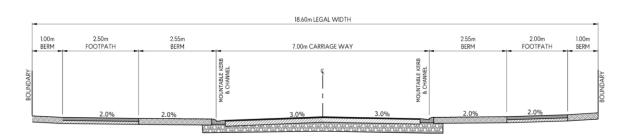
Typical Cross-Section (D) Collector – 18.6m with Berm
